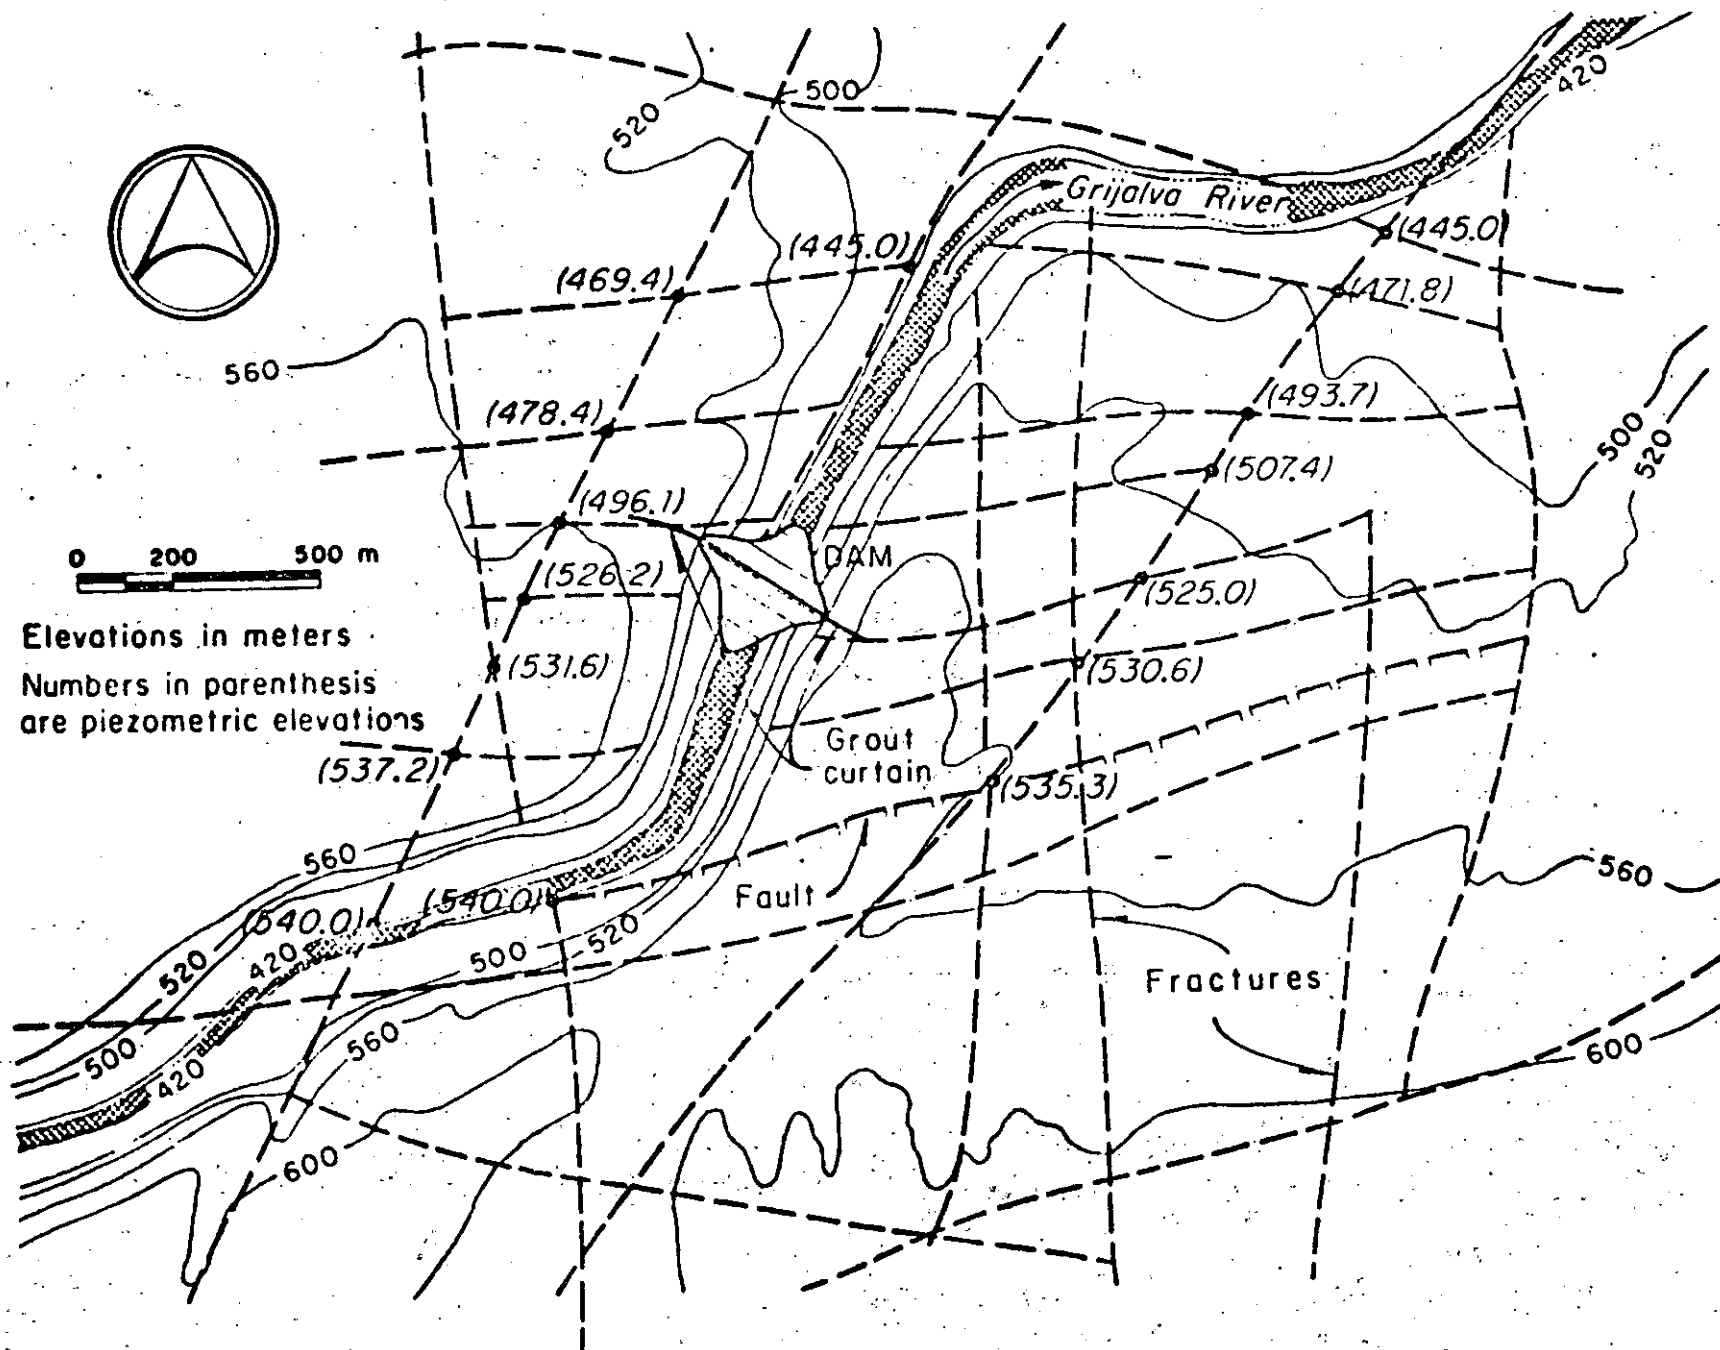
Grid of fractures and some of the computed piezometric elevations at La Angostura damsite
